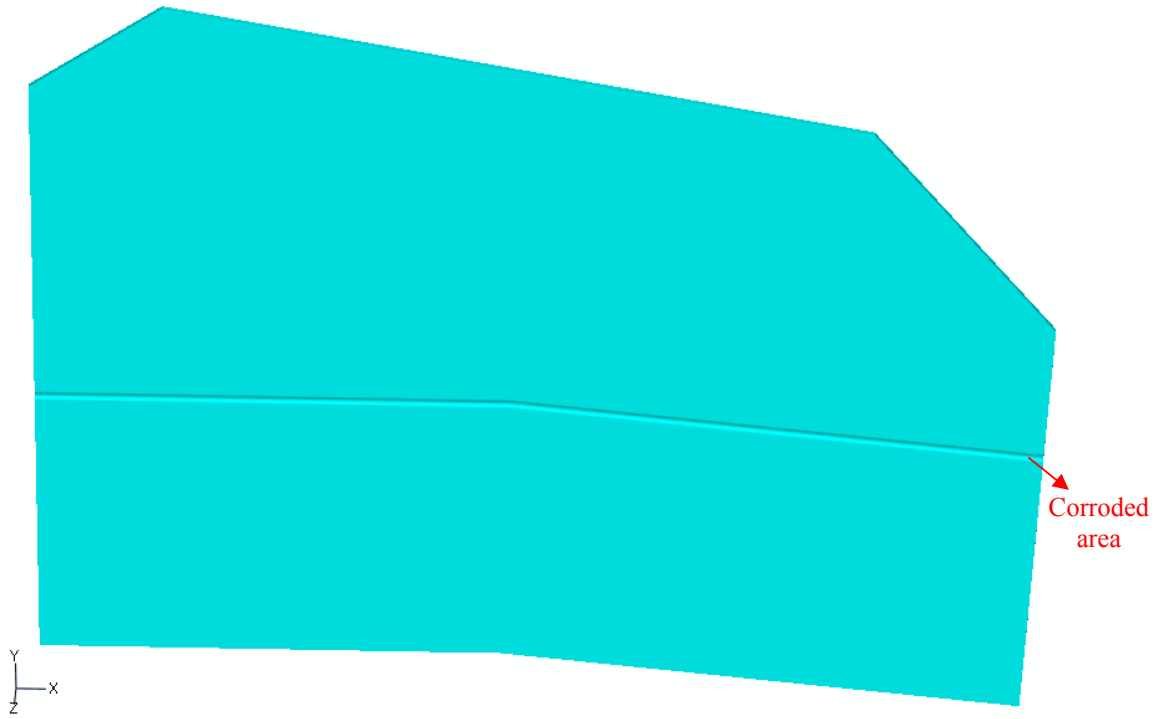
Corroded area in the west gusset plate at the L11W joint
